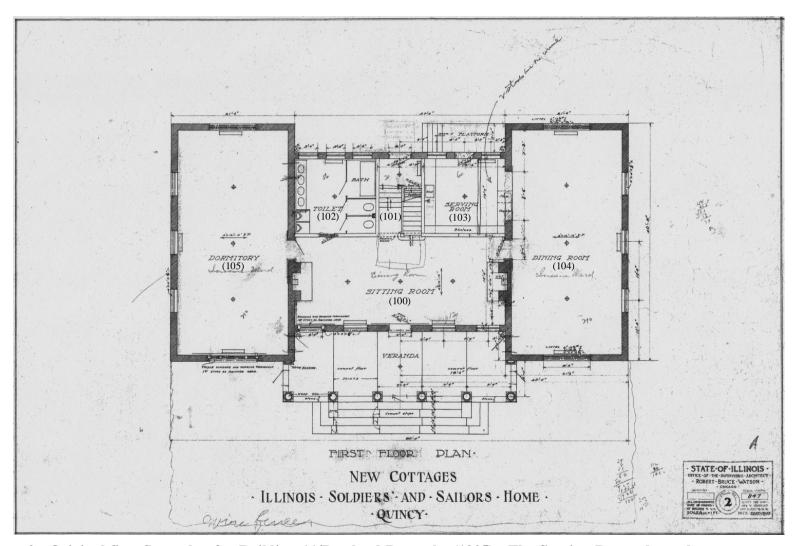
Original first floor plan for Building 11/Rowland Barracks (1905). The Serving Room shown later was converted into a office/storage room. The penciled notations on the plan are believed to refer to later changes and uses to one of Building 11's "sister" cottages. Room numbers have been added to the plans for reference purposes.
